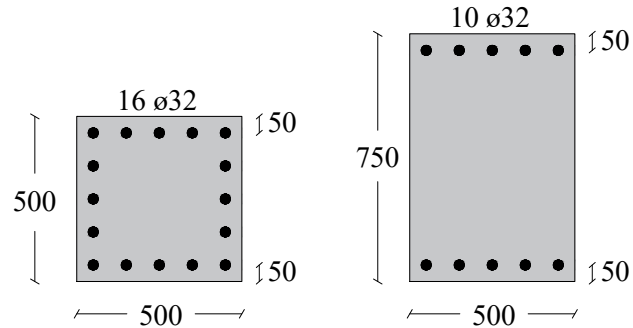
Bridge column and beam cross sections. Units in mm.
